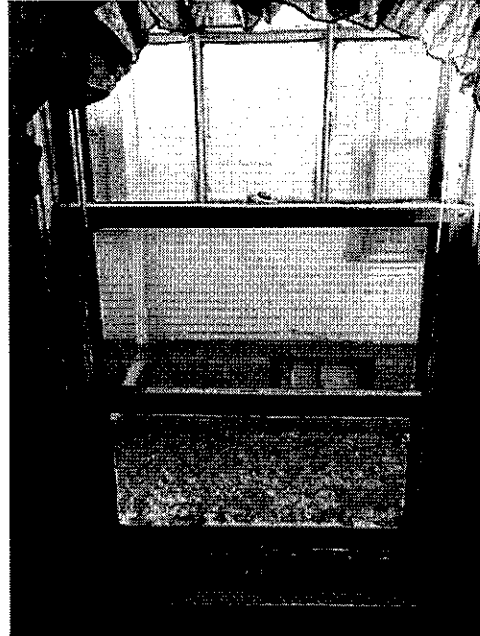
1-over-1 attic windows in the south gabled bay. Attic windows on the south and west elevation will be replaced in kind.
